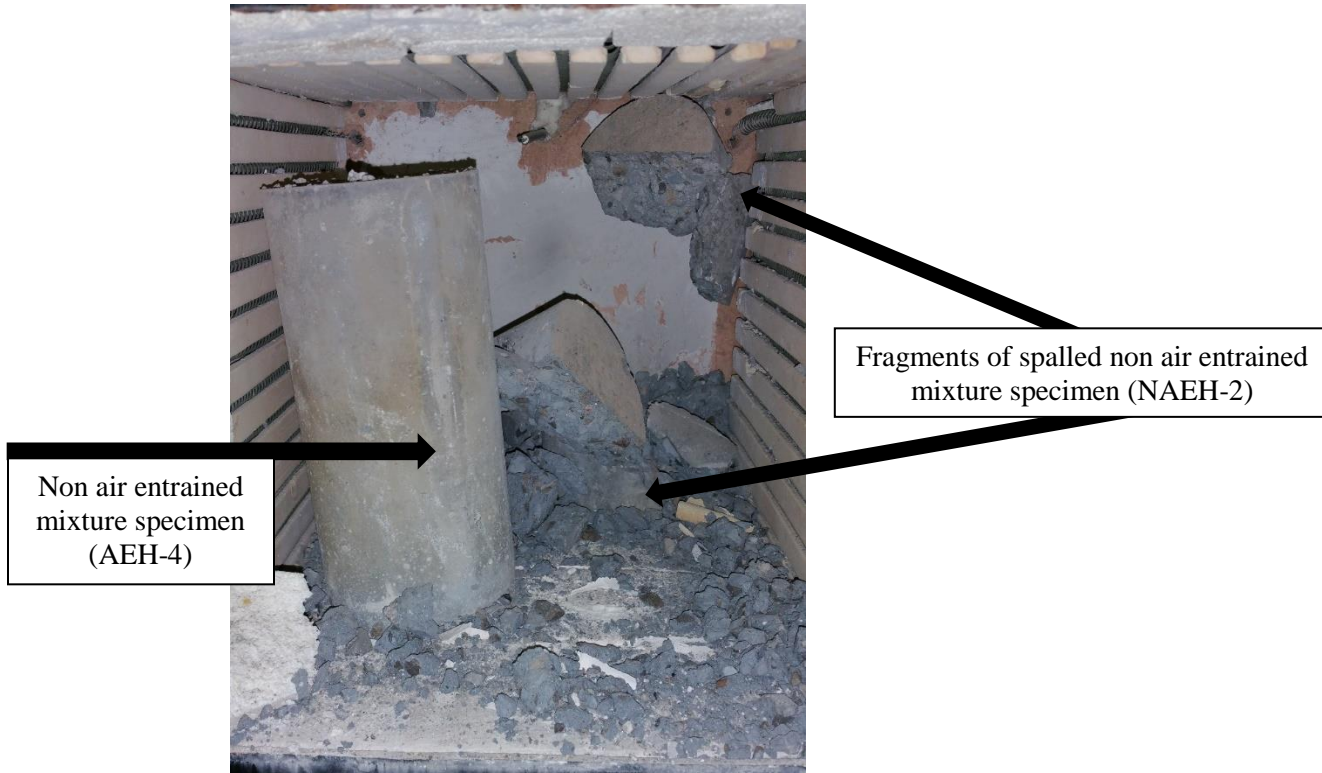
Spalling (explosive) of NAEH-2 mixture specimen
